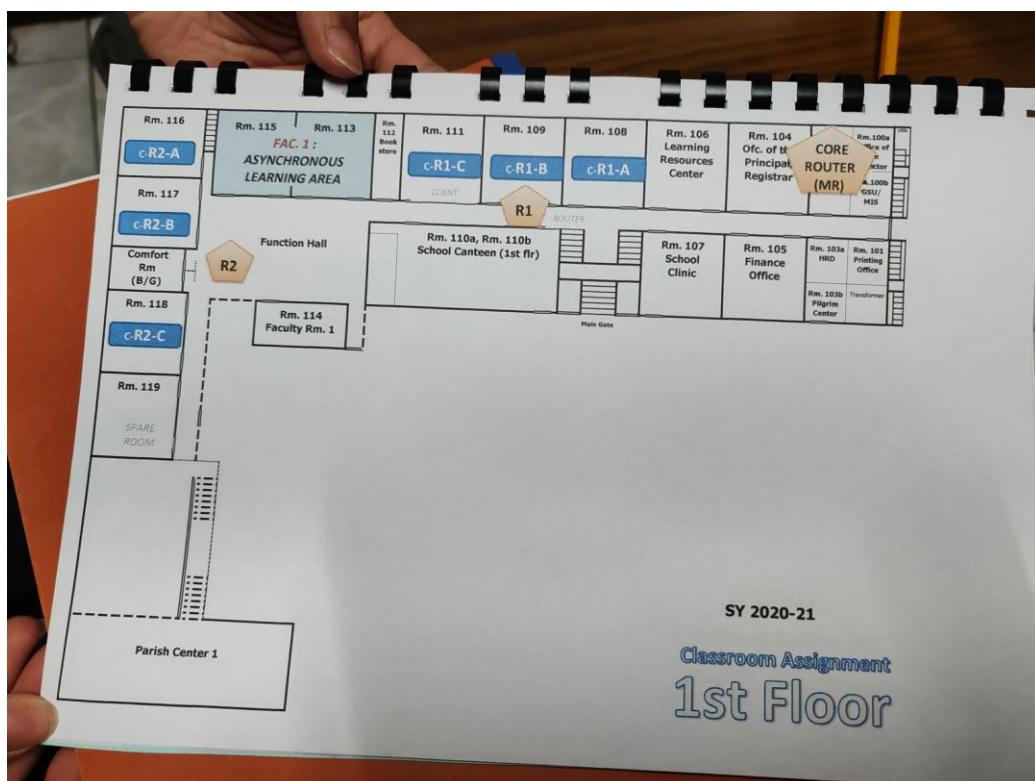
Floor plan of the first floor of NSDAPS' main campus
